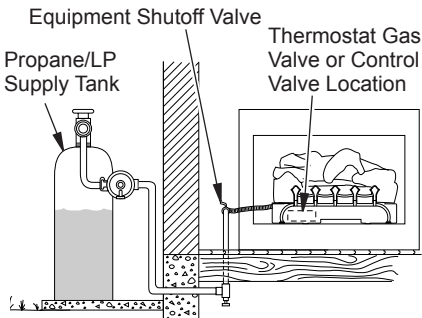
Checking Gas Joints (Propane/LP Gas Only)
